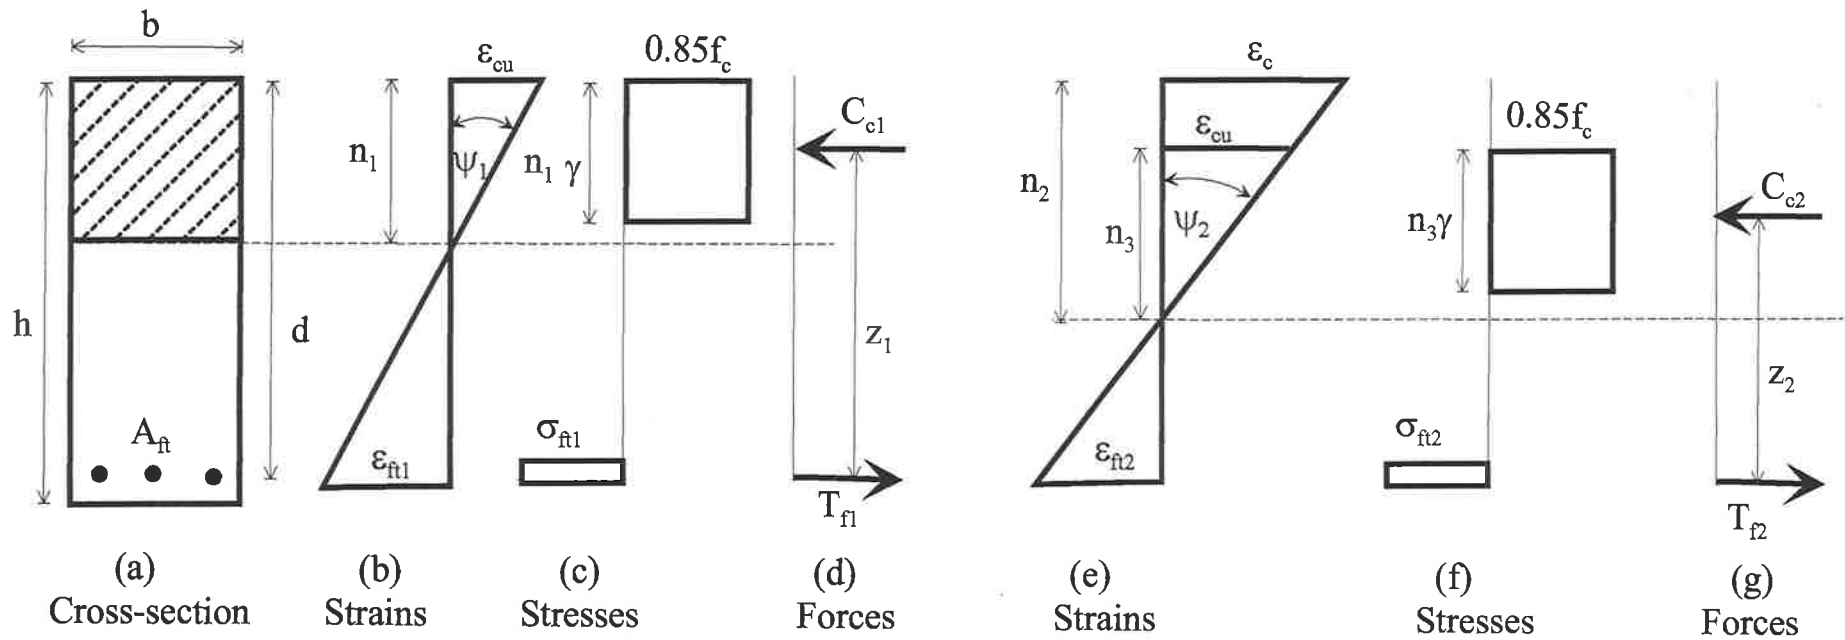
Singly reinforced concrete beam with FRP reinforcing bars.
